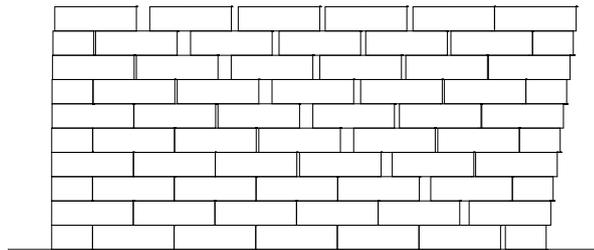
Sliding failure for the standard wall without any applied vertical overloads;
